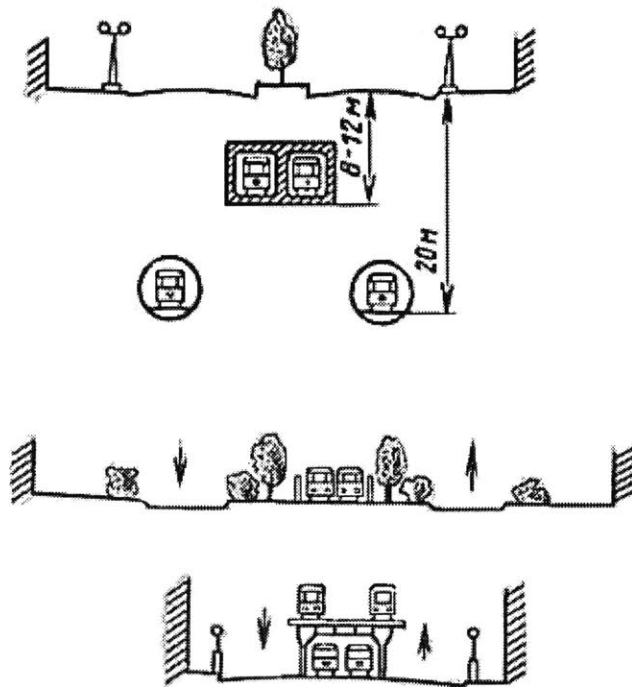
Alternatives considered for the design of at grade, below grade or elevated metro stations for the new "MetroLima." Transit Network
